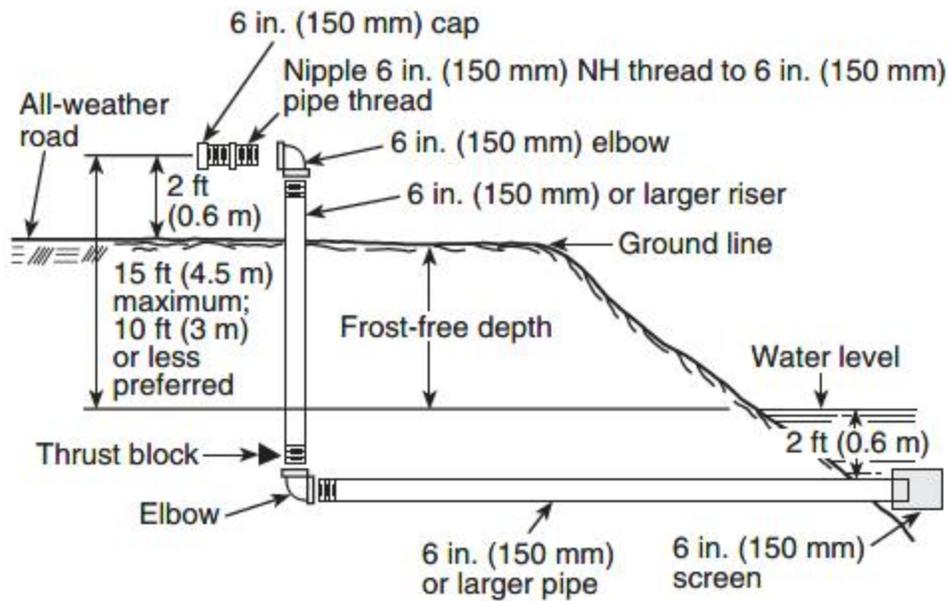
(b) Exploded View of Dry Hydrant Construction.
